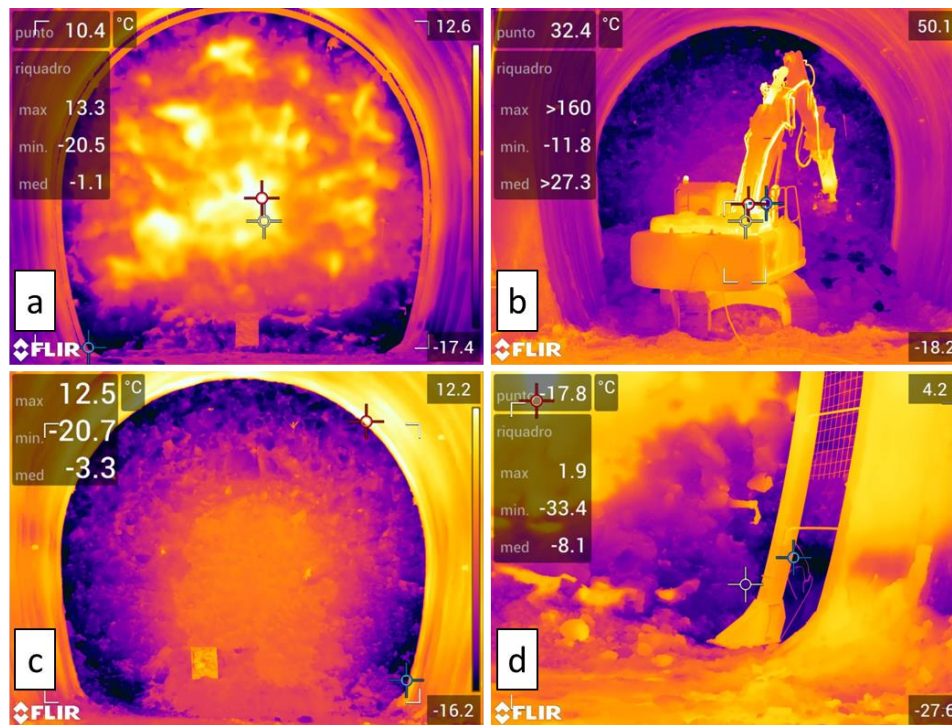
IRT images from Isarco Underpass site during excavation phase: a) excavation face covered by shotcrete; b) hydraulic hammer detaching frozen soil blocks; c) free excavation face of frozen soil; d) freezing pipe fed with brine as coolant.
